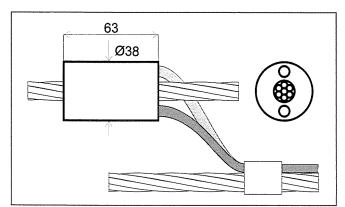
Sensors pulled onto tendons built-in UBx typr prefabricated, prestressed concrete beams
